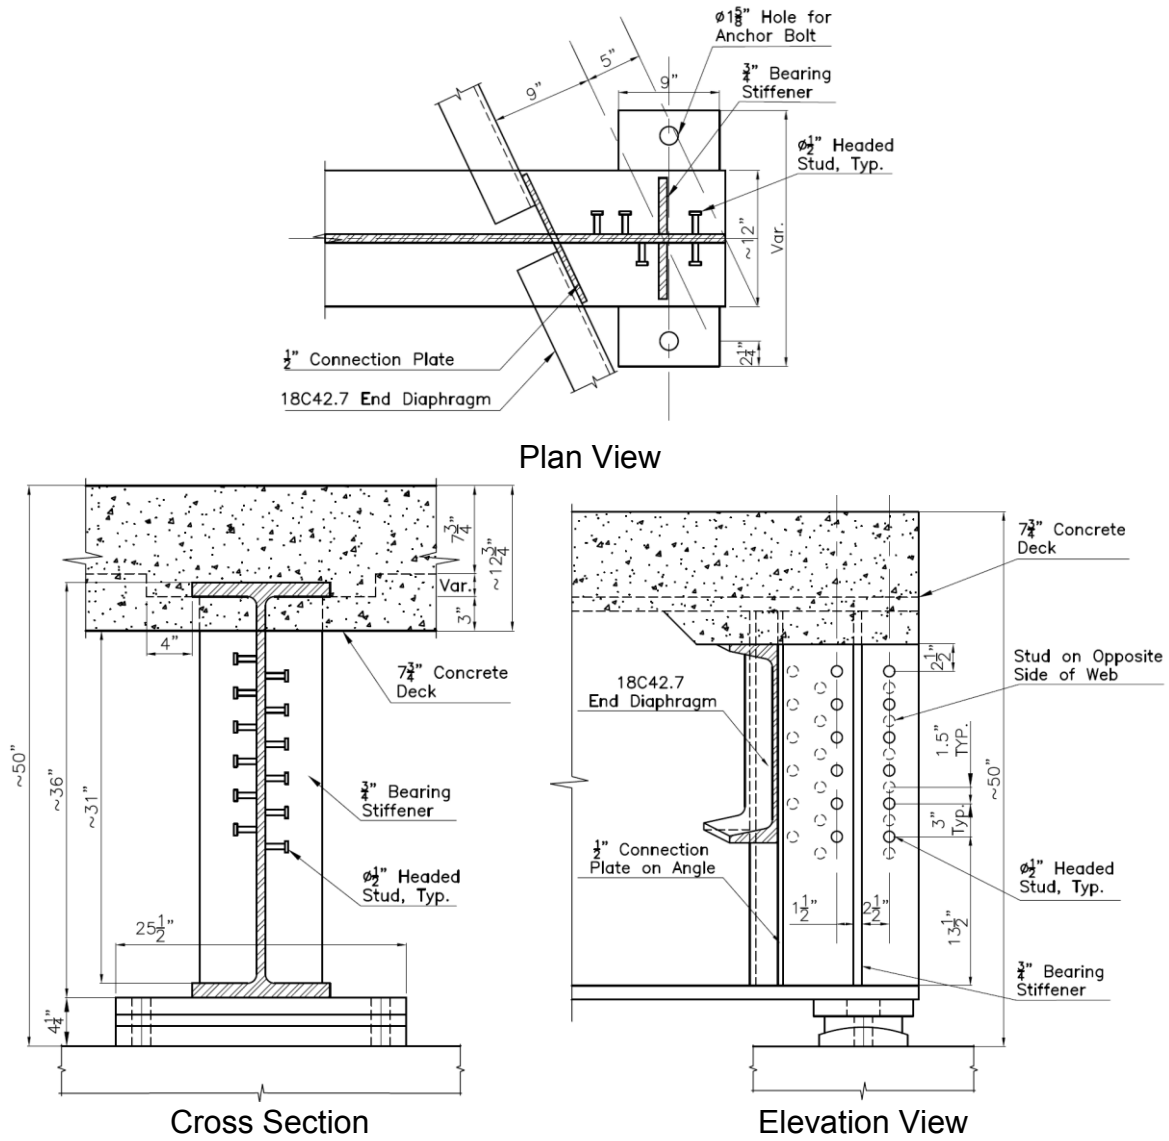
Design of potential shear stud layout for a corroded girder end
